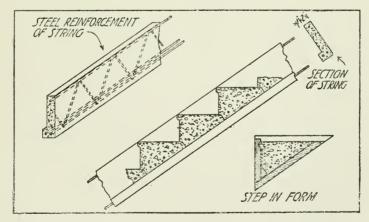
CONSTRUCTION OF INTERNAL STAIRS.
